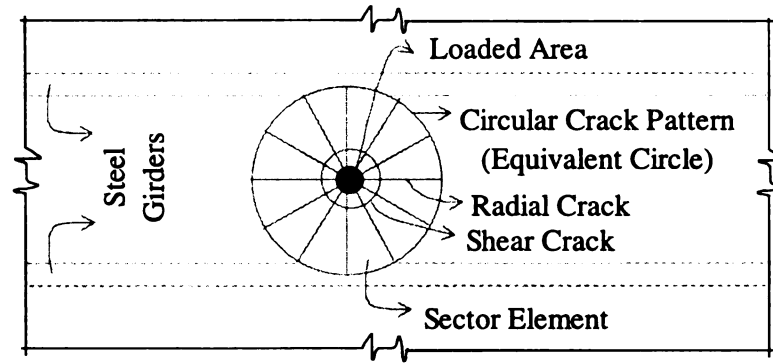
Crack Pattern of Restrained Deck Slab (Plan View)
